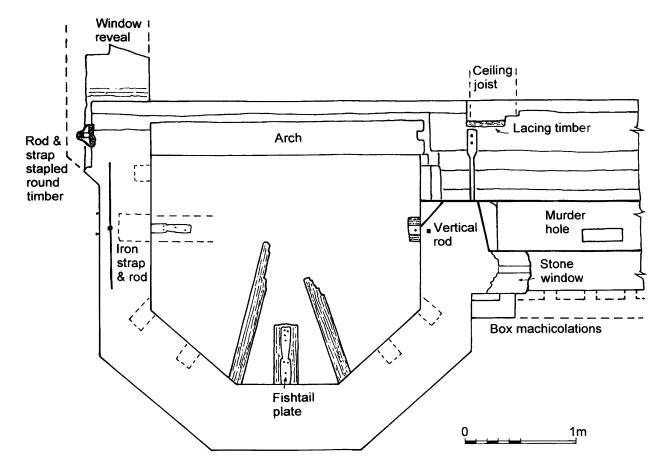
Plan of the west tower at the second floor, showing detail of the floor construction.
